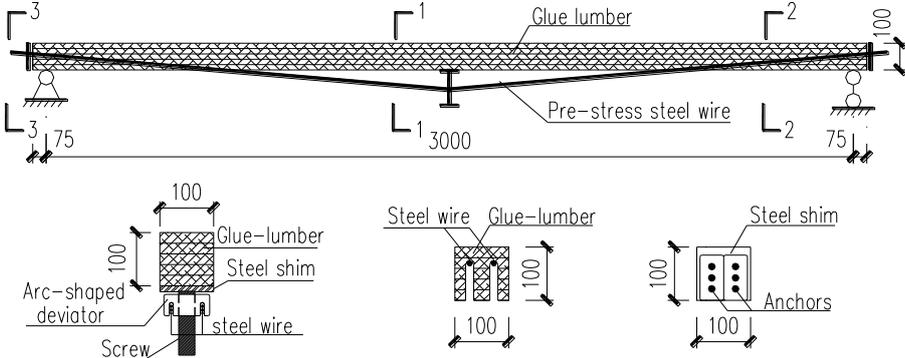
Diagrammatic sketch of pre-stressed glue-lumber beam (unit:mm)
